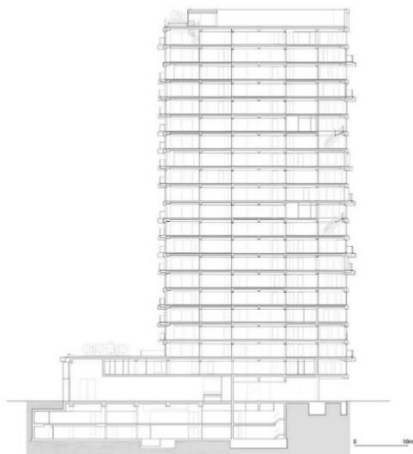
Section of Haut .Amsterdam (Url-1, 2024).
